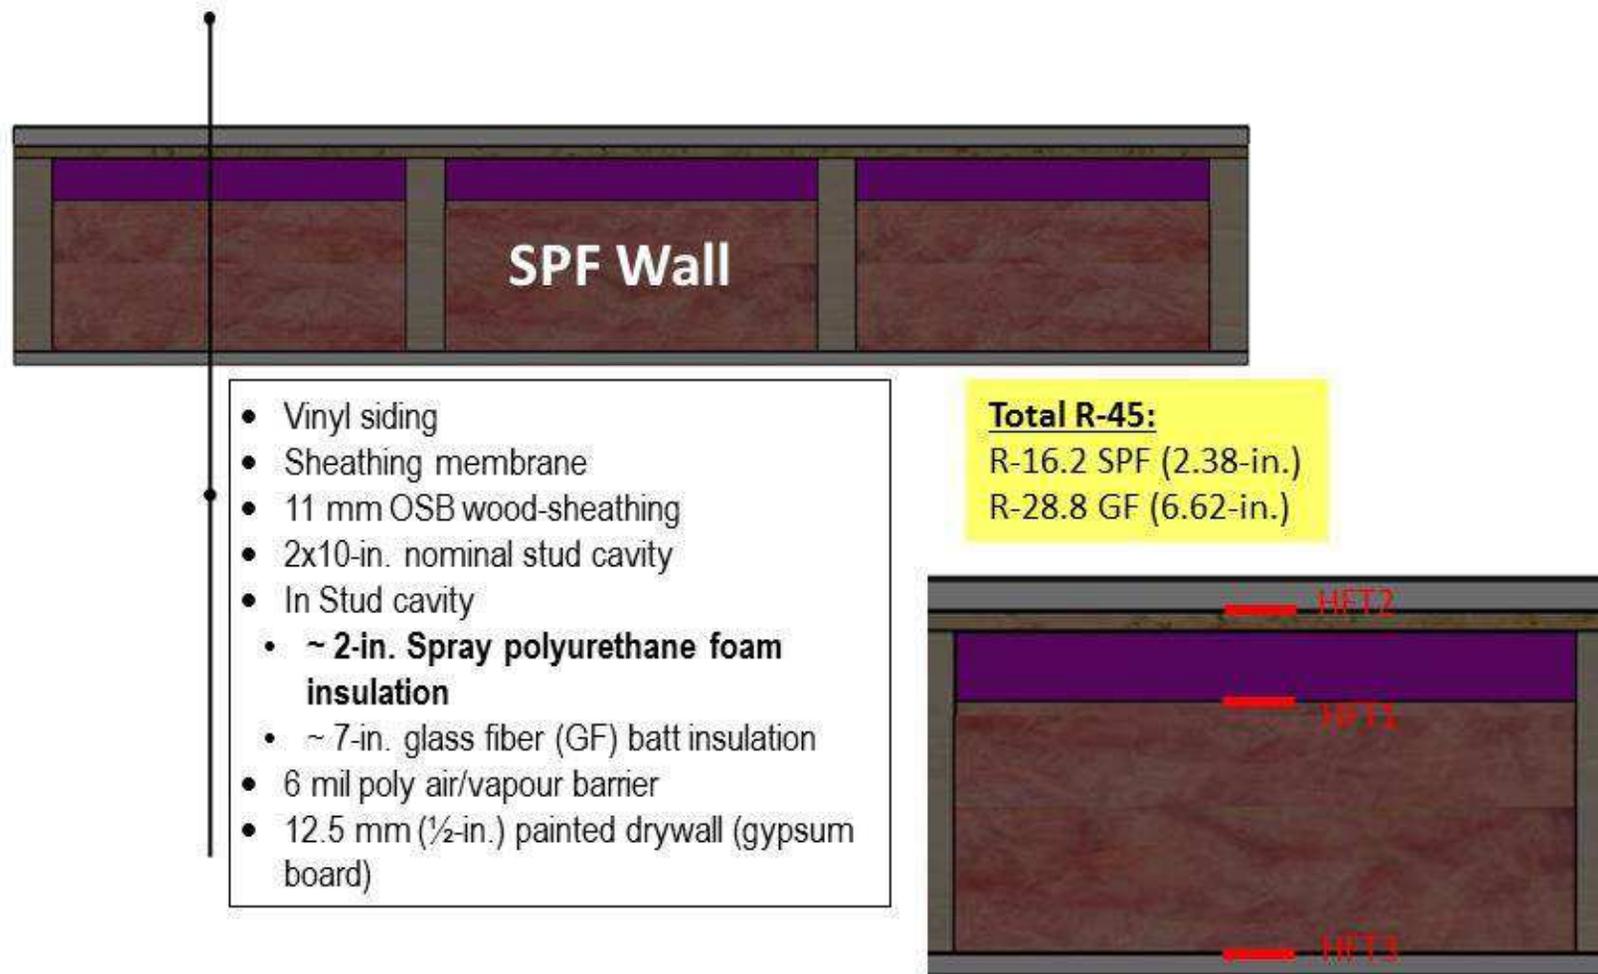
Horizontal cross-section through SPF wall assembly showing locations of Heat Flux Transducers, HFTs (Wall-5)
